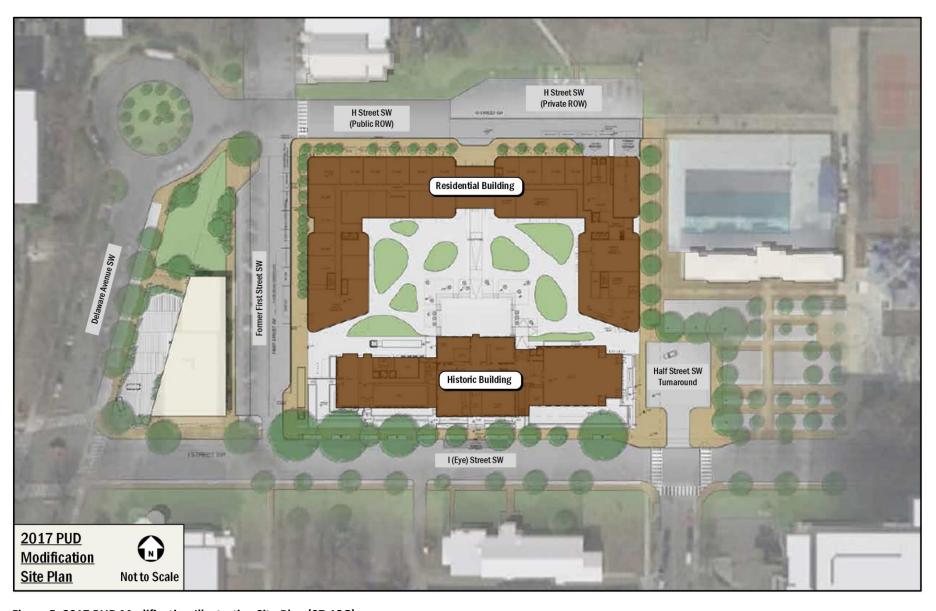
2017 PUD Modification Illustrative Site Plan (07-13G)
